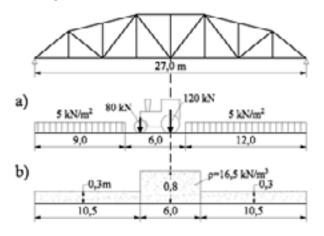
Test loading of the bridge: a) load model according to [12], b) actual test loading
